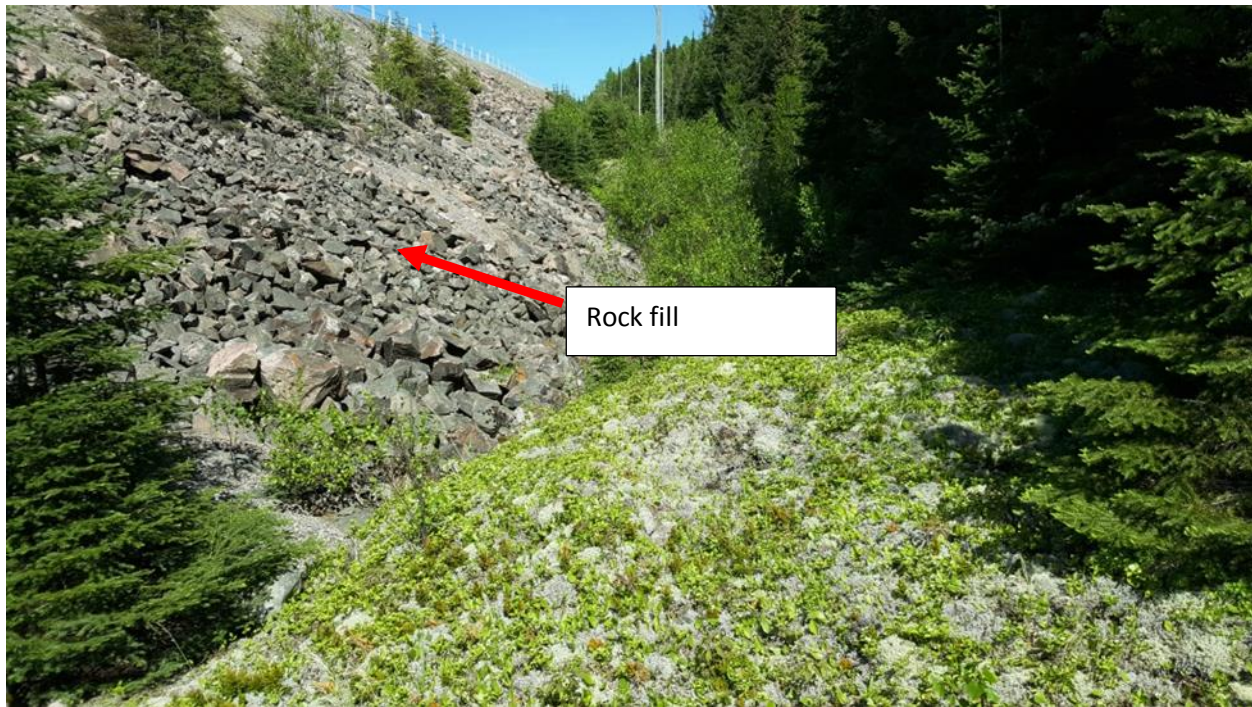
Looking toward west - Rock fill (June 2017)
